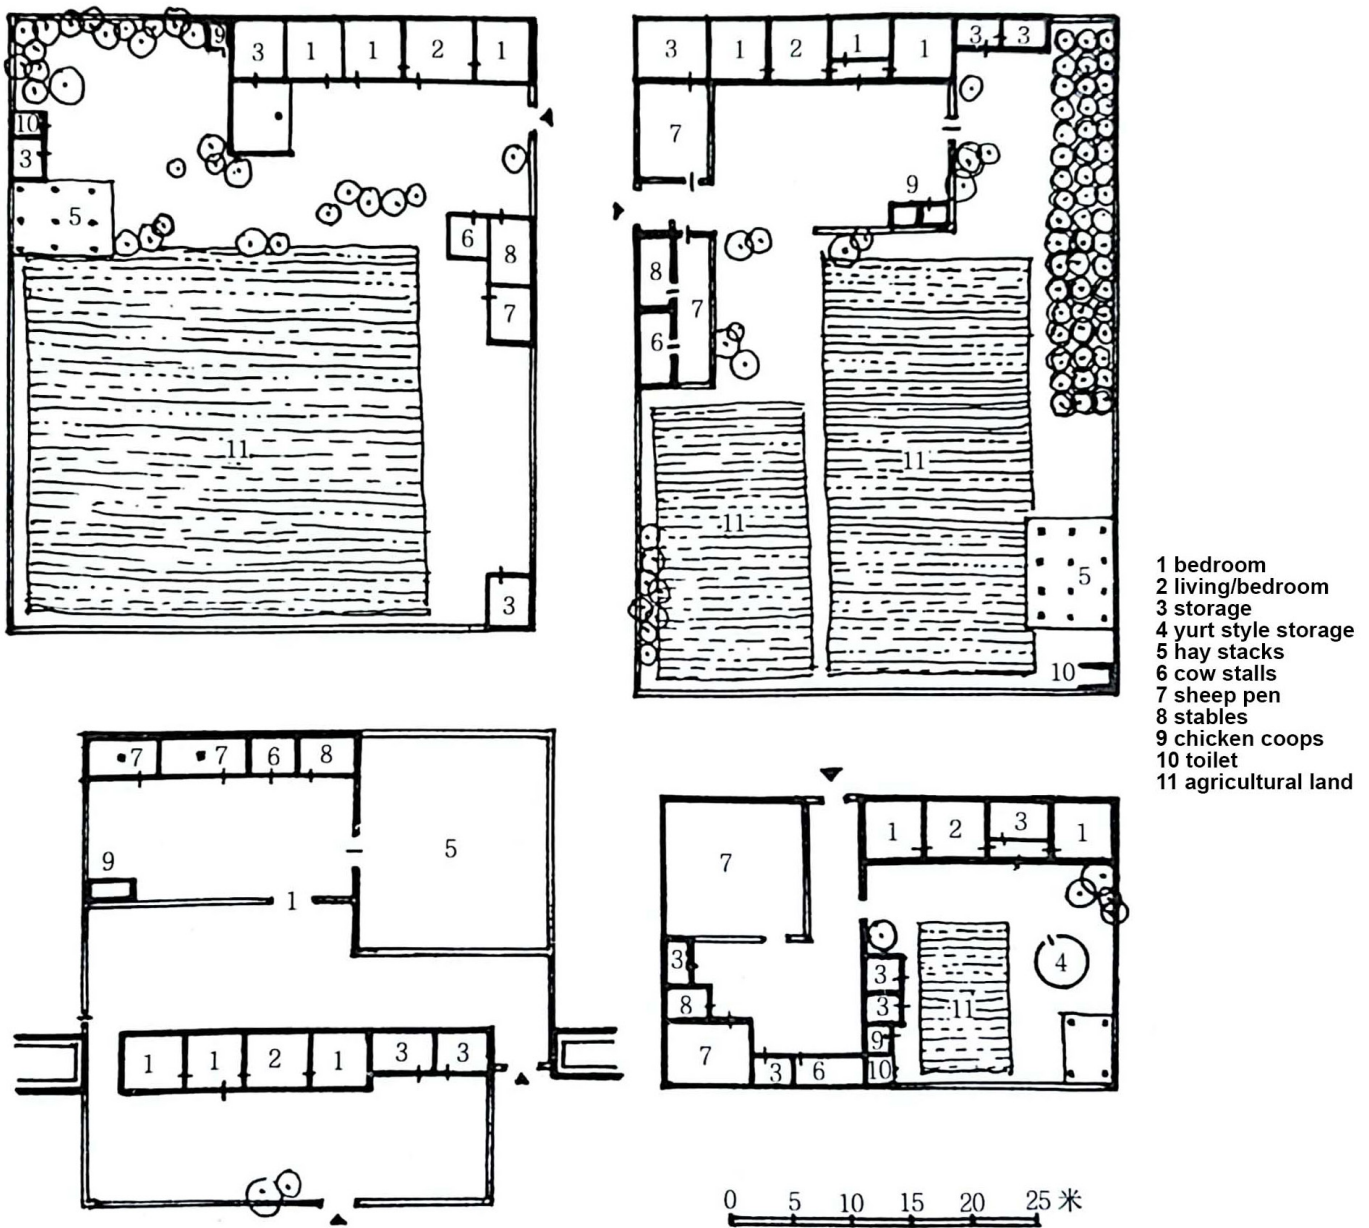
Plans of four typical courtyard layout.⁹⁷ Translated by author.
